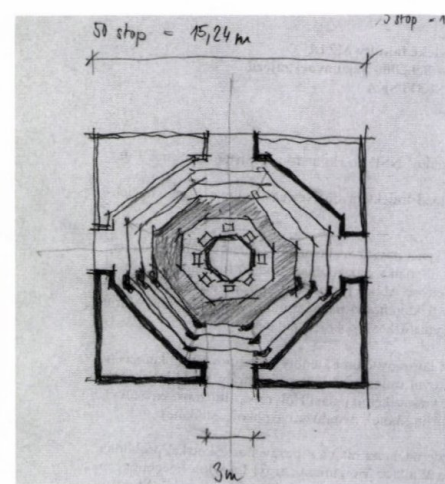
, 4. Z. Lecsche, Pleasure House, about 1642, sketch of the the potential groundplan
